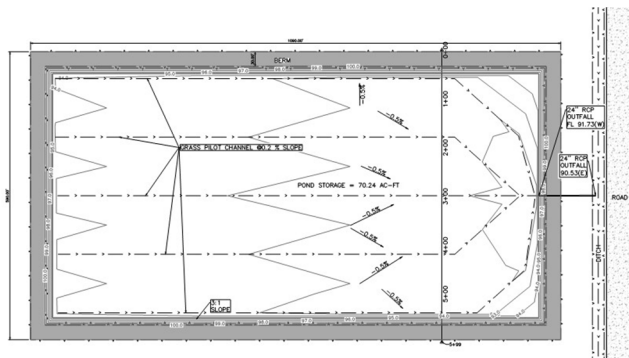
Detention Pond with Multiple Pilot Channel - Plan View
